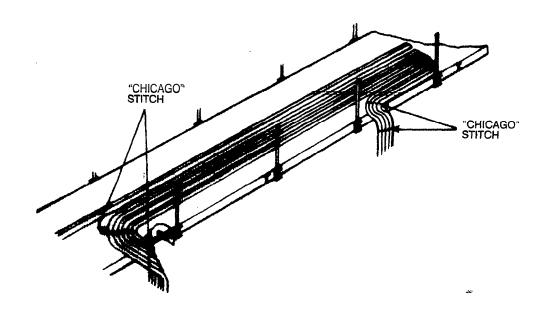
Typical Cable Run Showing Break-Offs and Stitching at Break-Offs
